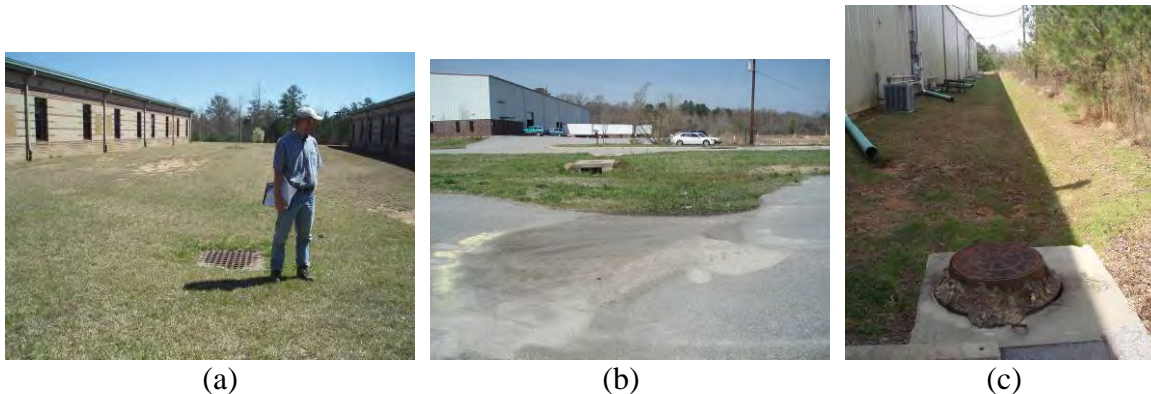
(a) Opportunity for restoration at Forest Hills Elementary School (K-RRRI-6) by disconnecting downspout and directing to a bioretention facility for treatment; (b) staining of pavement indicates stormwater tends to sit in this proposed location for a bioretention practice at Sunbelt Industrial Site (K-RRRI-4); and (c) a dry swale at Sunbelt Industrial Site (K-RRRI-4) could be enhanced for more effective treatment of stormwater before it enters the stormwater system.
